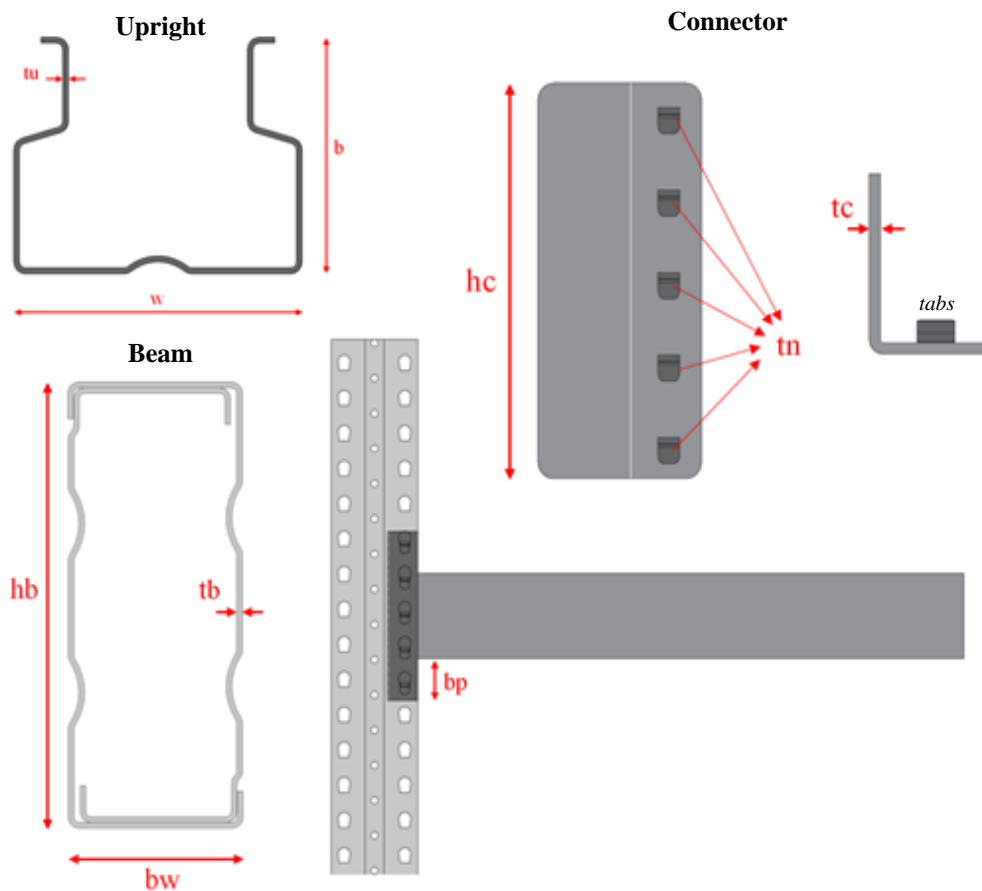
Geometric parameters of the upright section used in the beam-to-upright connection, geometric parameters of the cold-formed beam section, connector geometry and tab configuration defining the number of engaged tabs, and beam-to-upright connection assembly showing the beam position relative to the upright and connector.
